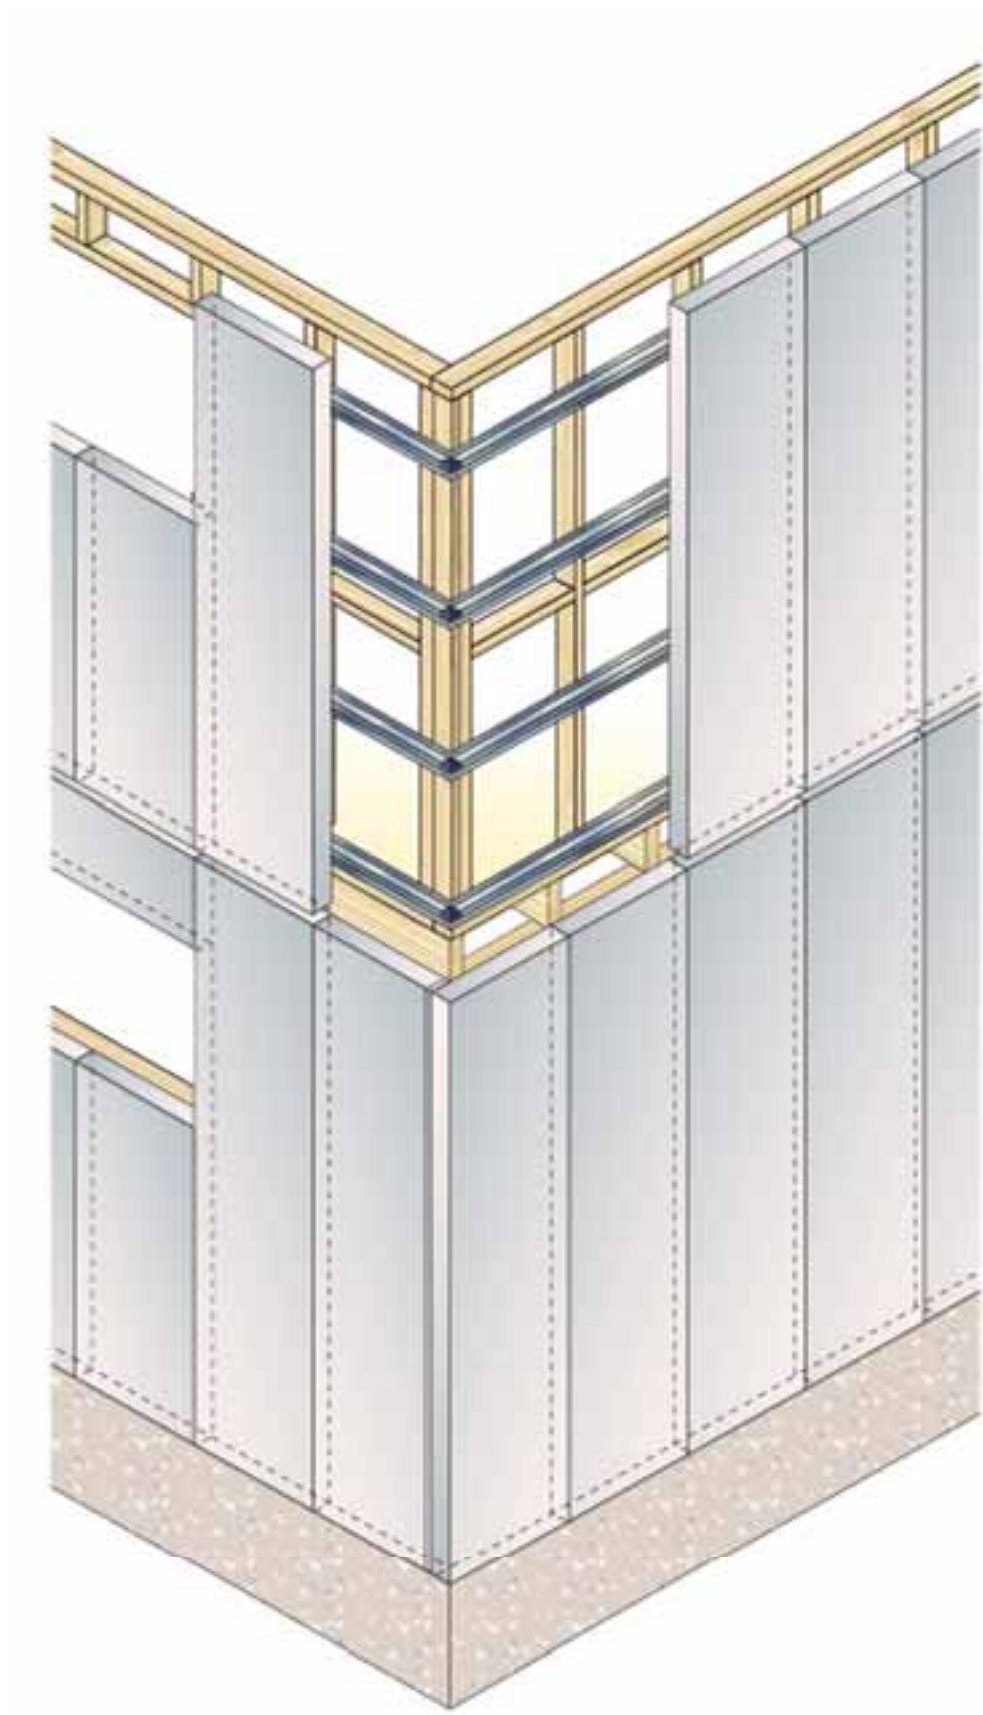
Single Storey Construction - High Wall Section Detail
